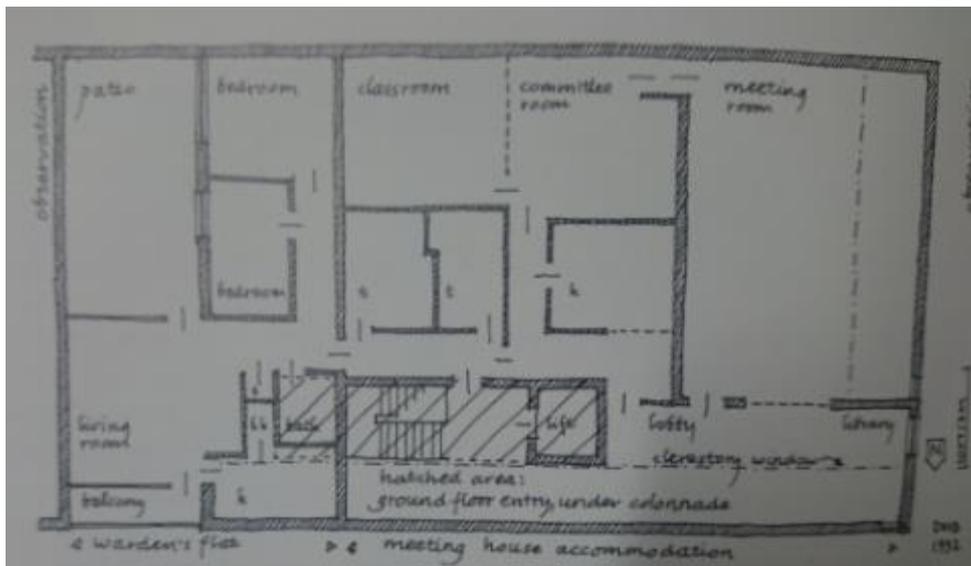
Figure 2: Ground floor plan of the meeting house in 1975 as reconstructed by Butler (north is to the right; not to scale) (Butler (1999), vol. 1, p.46)
